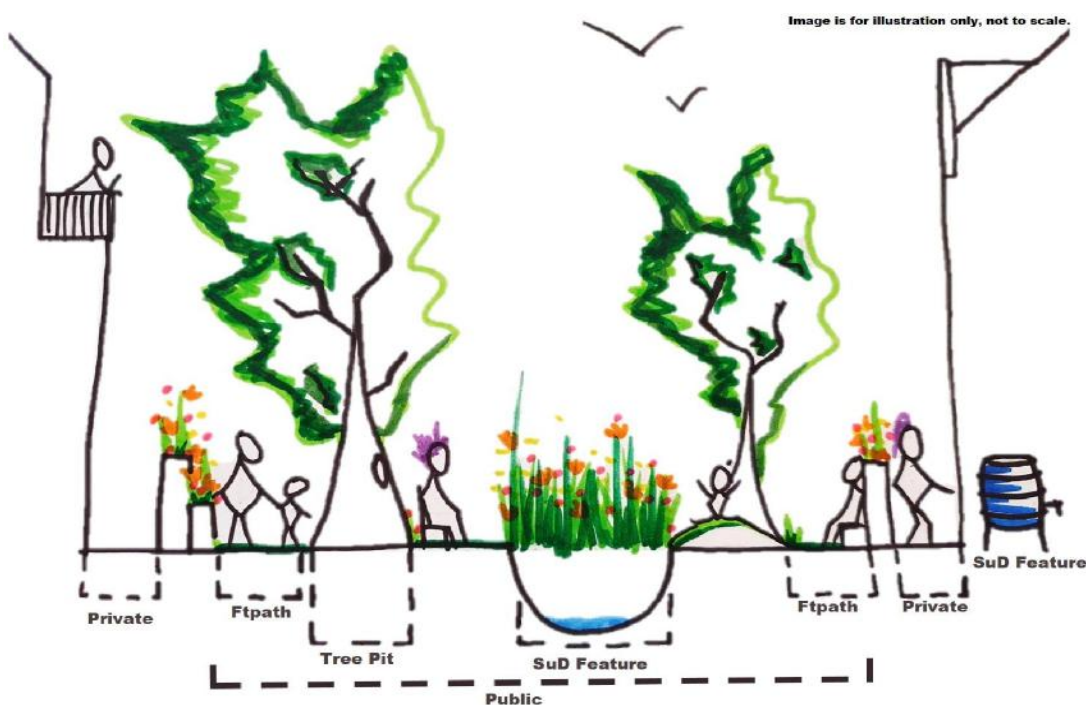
Section diagram demonstrating the 'SuD street' concept building line to building line
